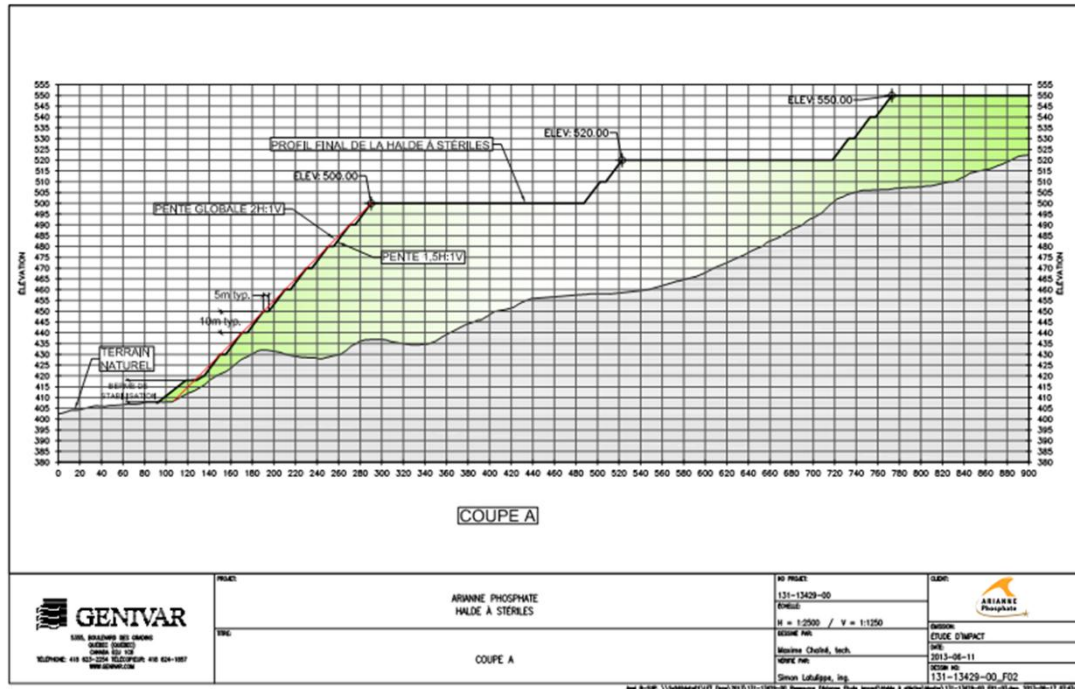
Cross-Section A view: Waste Rock Piles
